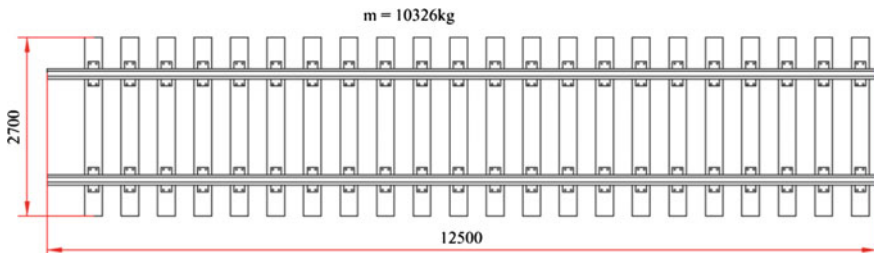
Pre-point assembly (switch R65-300-1:11, drawing no. E14-006/3, Voestalpine VAE Legetecha UAB)
